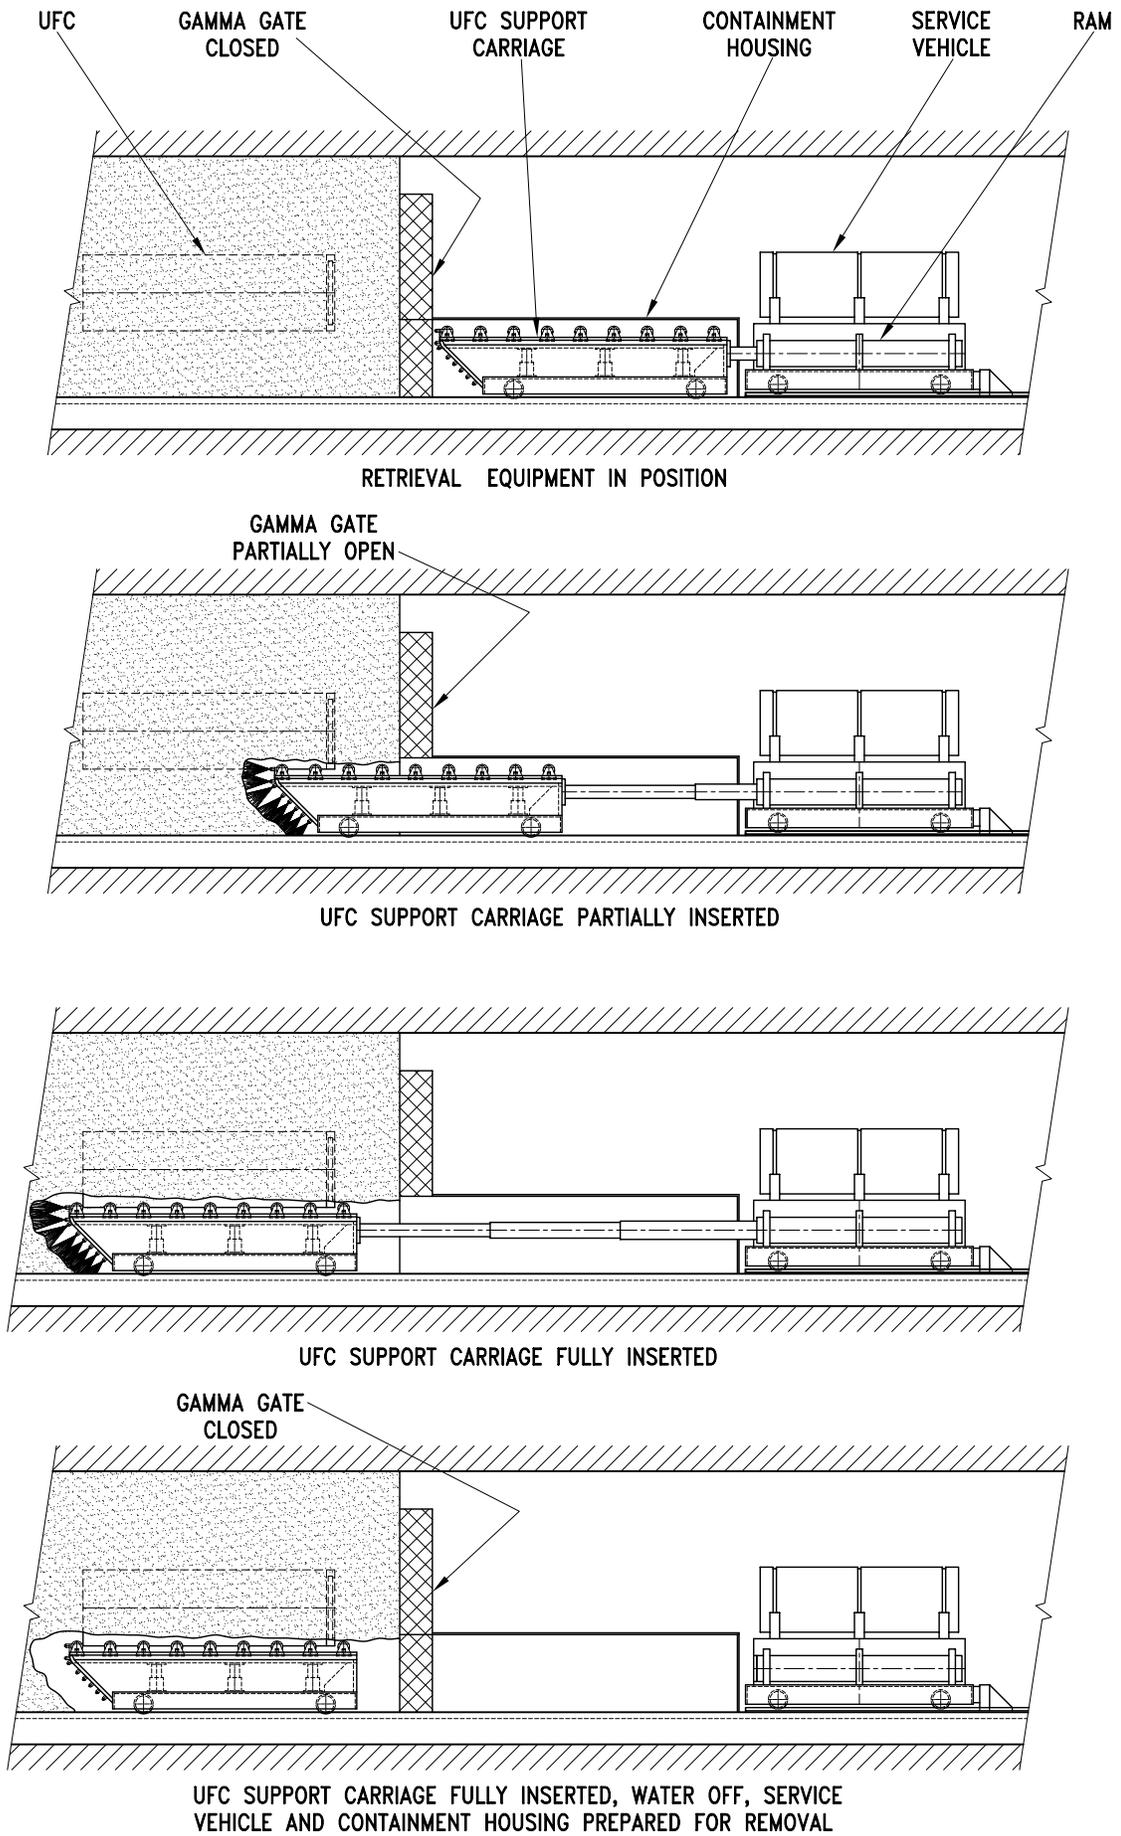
RECOVERY EQUIPMENT FOR REMOVAL OF LOWER SEALING MATERIALS
